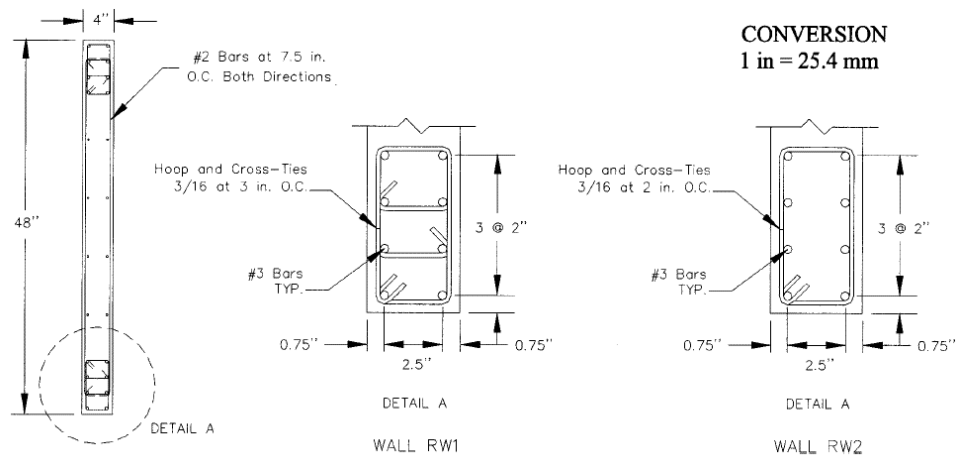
Cross-section details of rectangular walls (RW1 and RW2)
